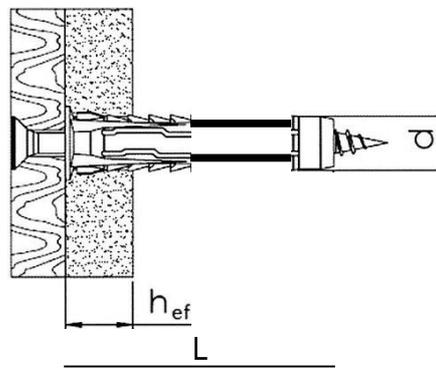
Parameters for installation and arrangement of 4ALL expansion anchors in gypsum plasterboard substrates
